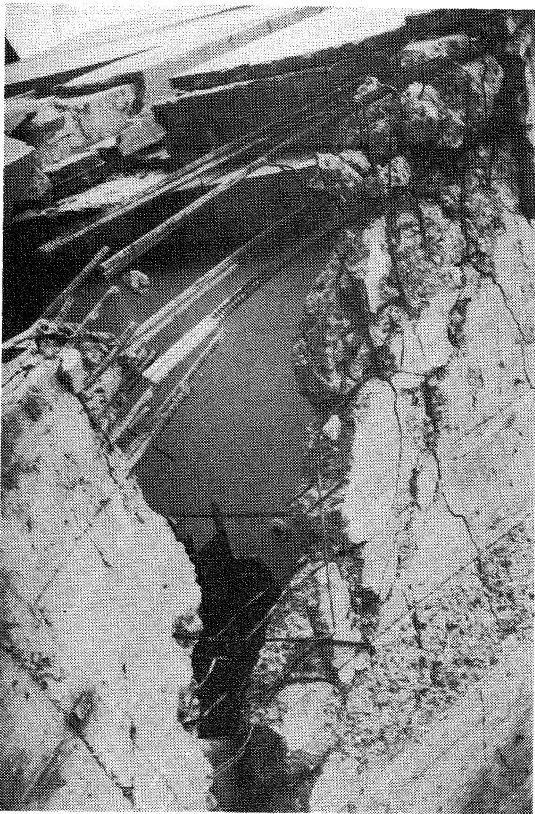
Tower block, Hyatt Terraces Hotel, Baguio; note light, widely spaced, ties and longitudinal bars spliced at one point
